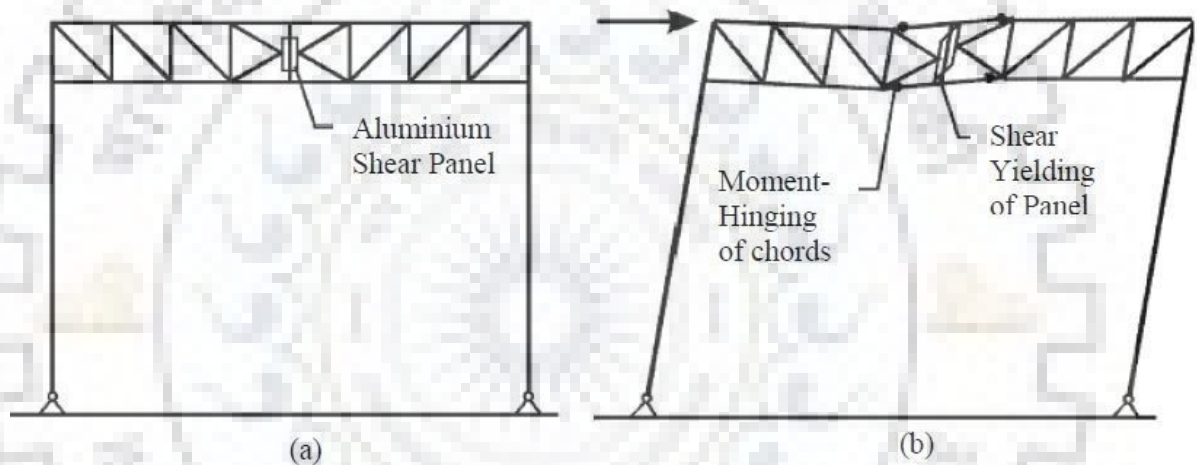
Typical arrangement of shear panel in Truss Moment Frame (b) Its collapse mechanism under lateral loads. (Rai, 1998)
